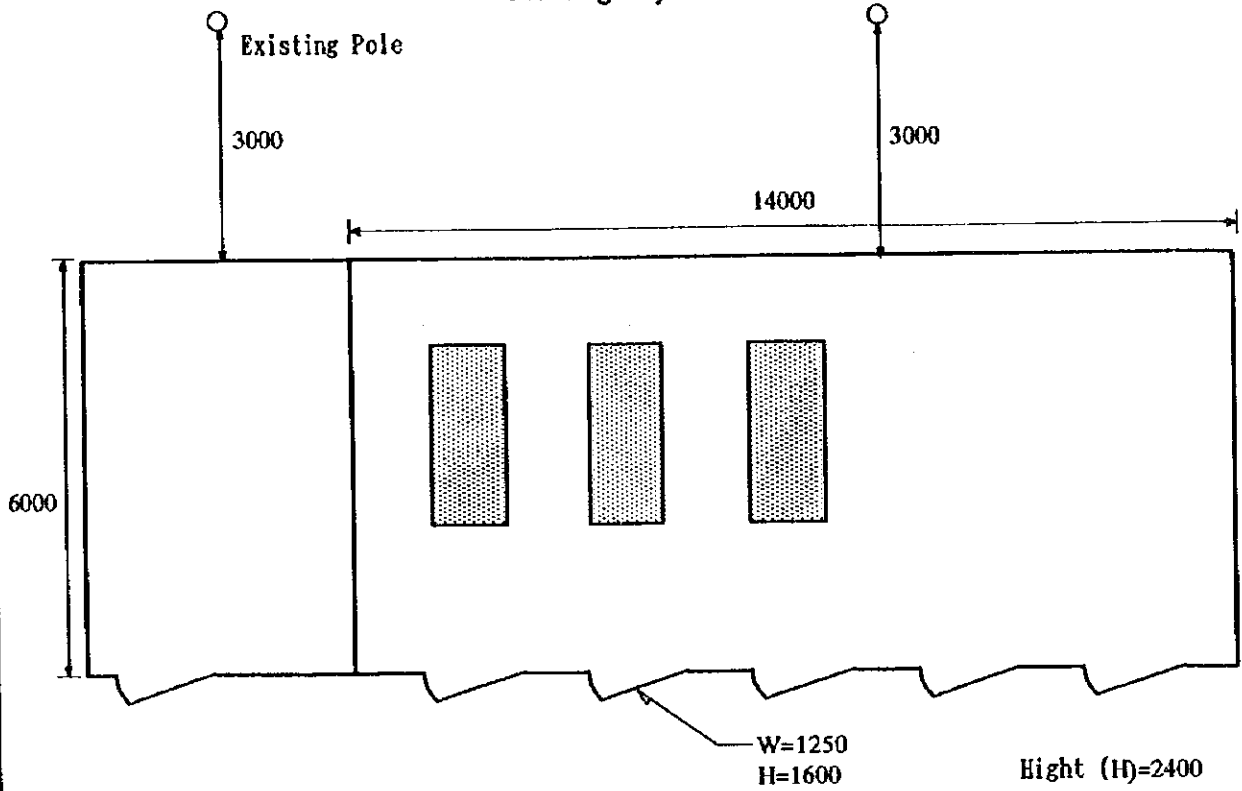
13 Layout Drawing of Bayan-Under
